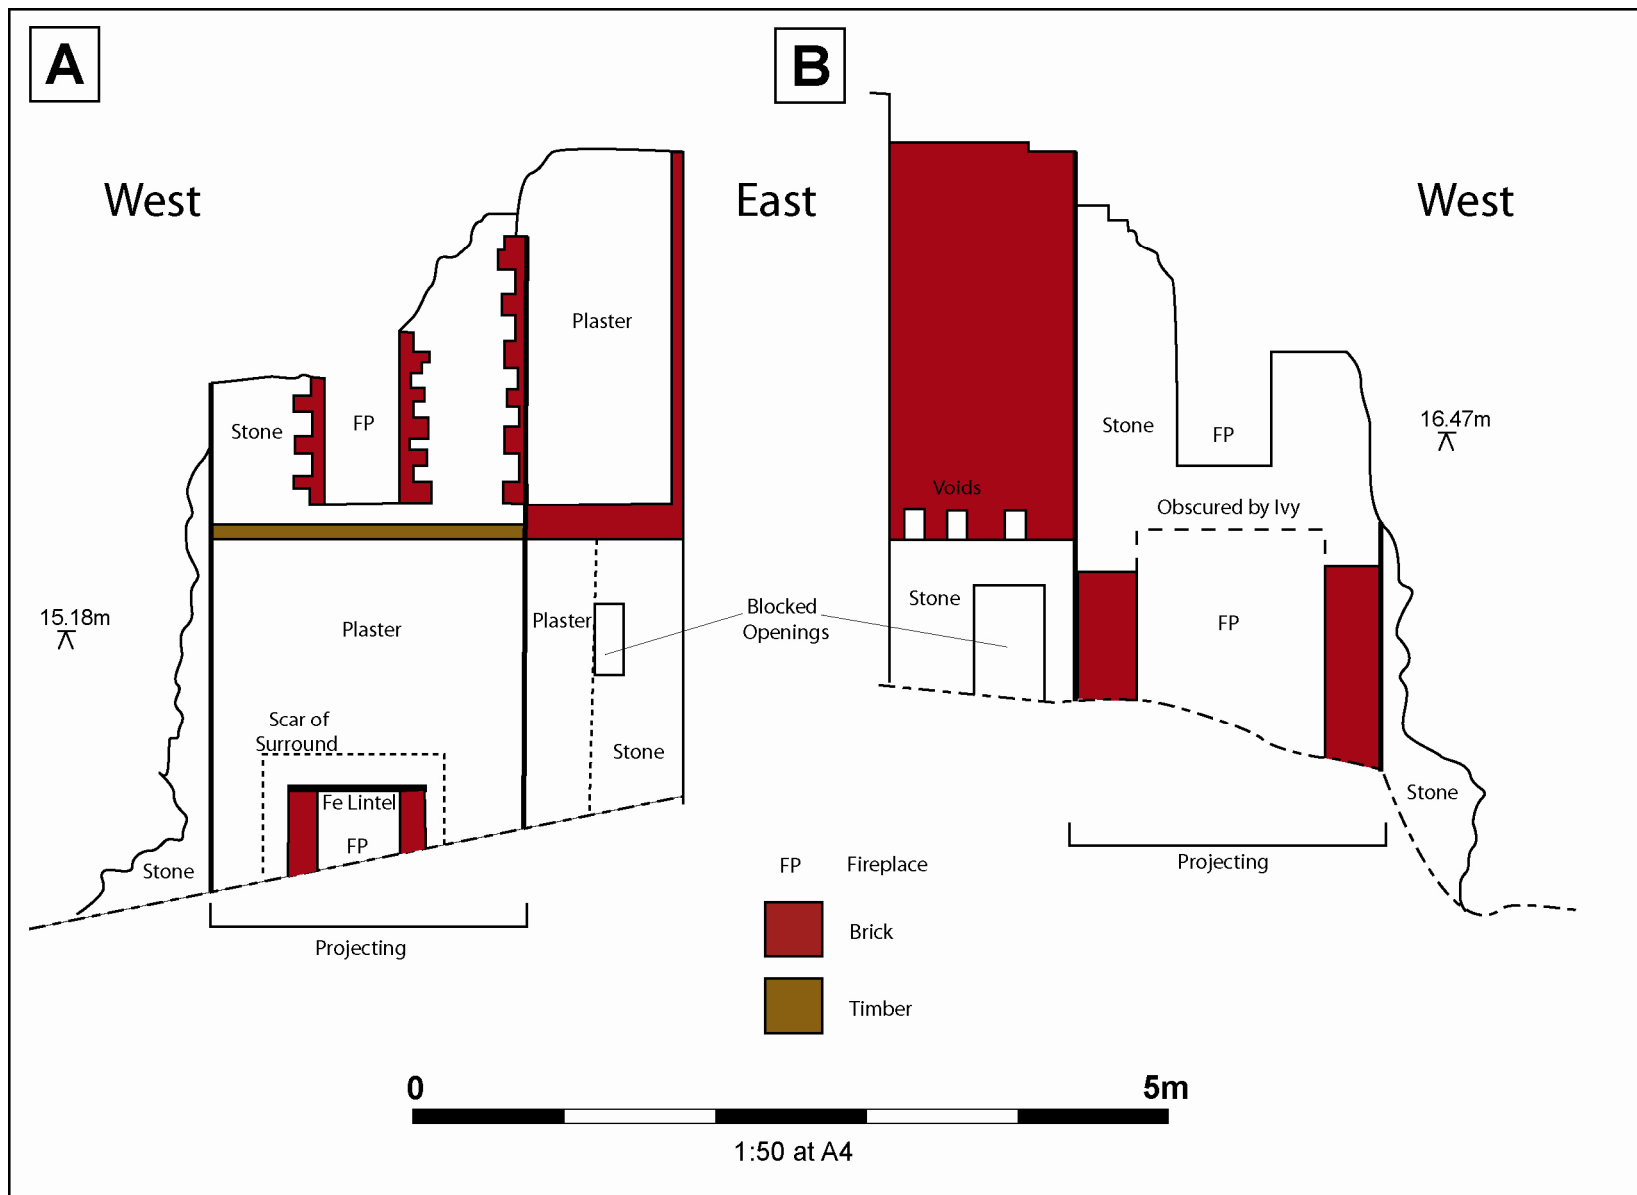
Elevation 5 viewed from the south-east (A) and north-west (B).
